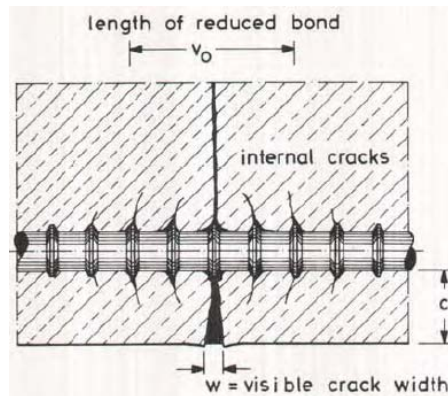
Depiction of internal cracks forming on rebar lugs (Leonhardt, 1988)
